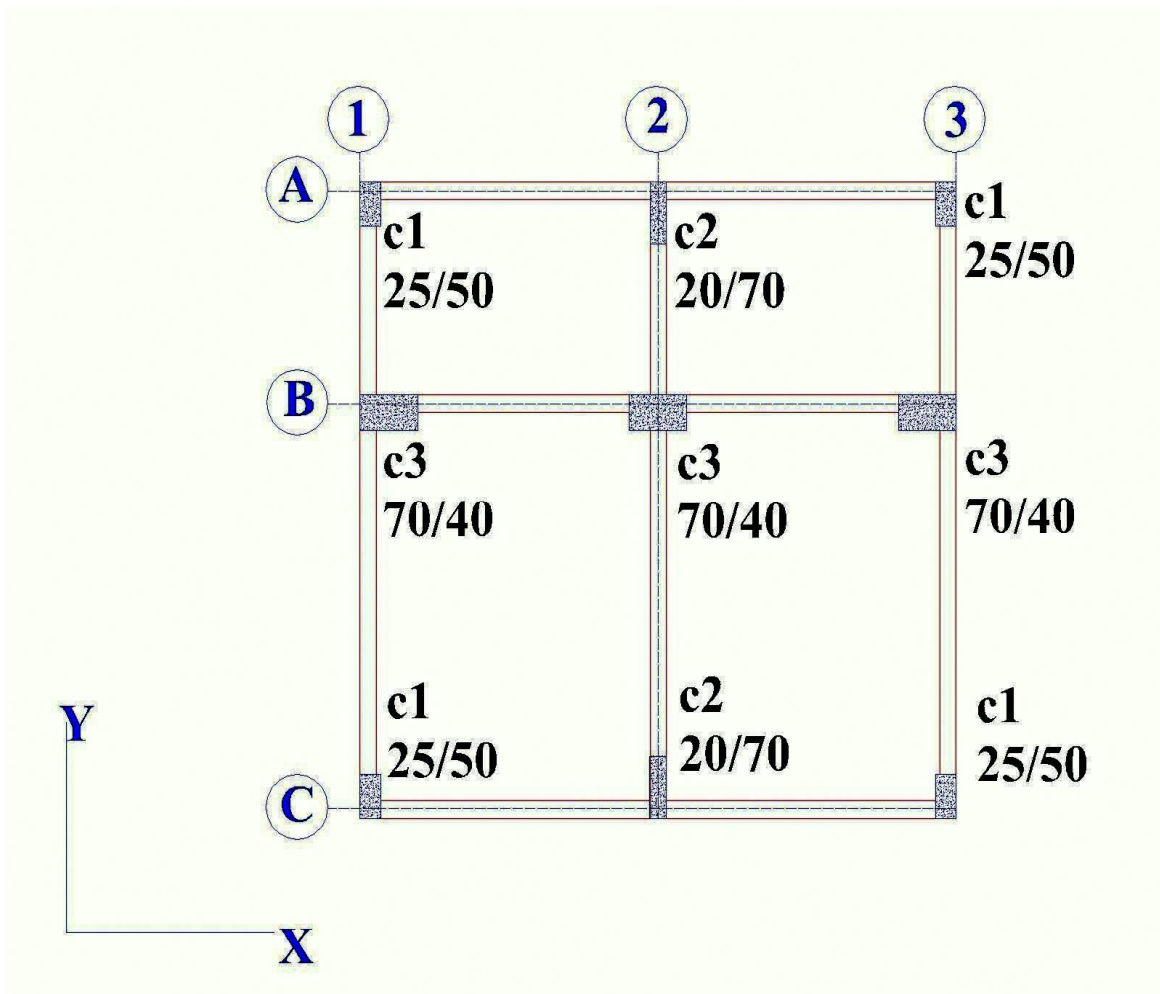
Example plan of building to illustrate the choice of dominant frames associated column in the X and Y direction of a building.
